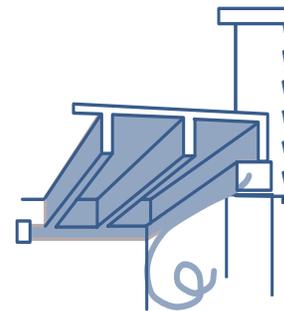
Backer rod or crack filler can also be used for sealing deep cracks or as a backing for caulk.
